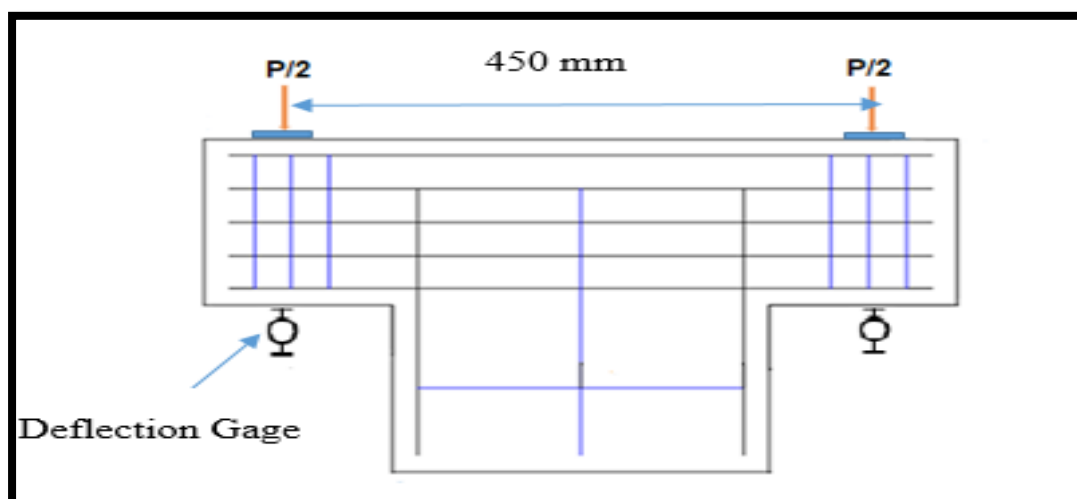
9 The Layout of points loads and the deflection gages for pier specimens
